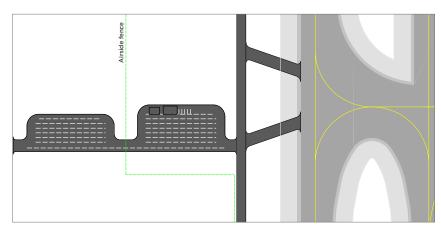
Proposed new runway emergency staging area concept Source: Perth Airport
